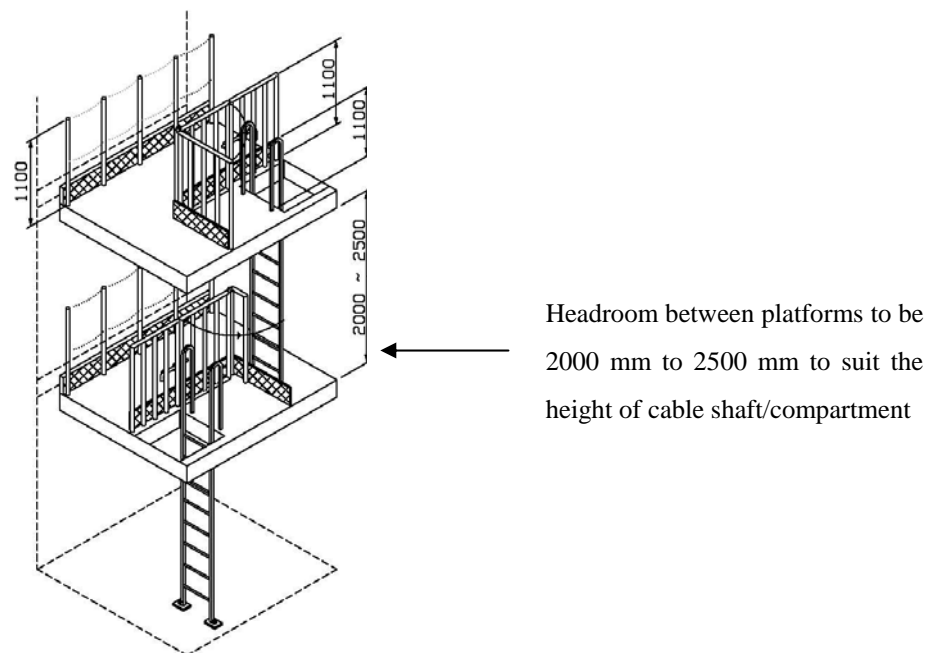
Typical Design of Working Platforms at Cable Shaft/Cable Compartment for 1/F Substation
